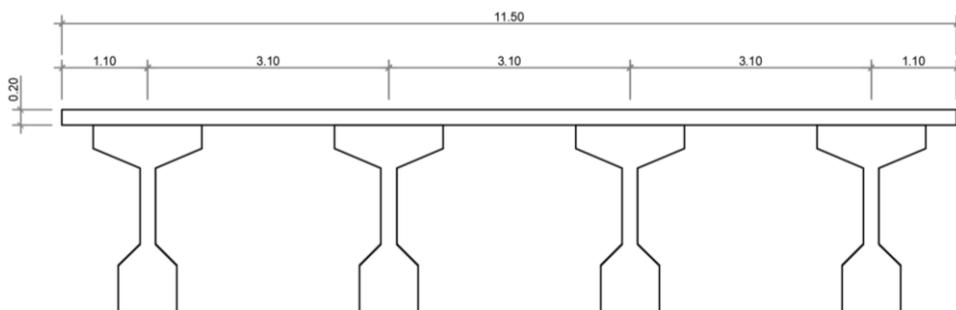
Cross section of the bridge with 40 m of span. Dimensions in m.
